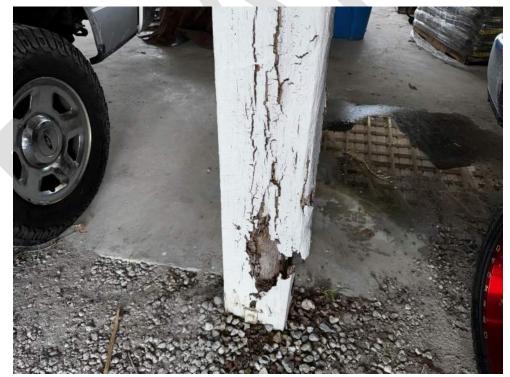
View of damaged wood column with evidence of termites (Column to be shored).
